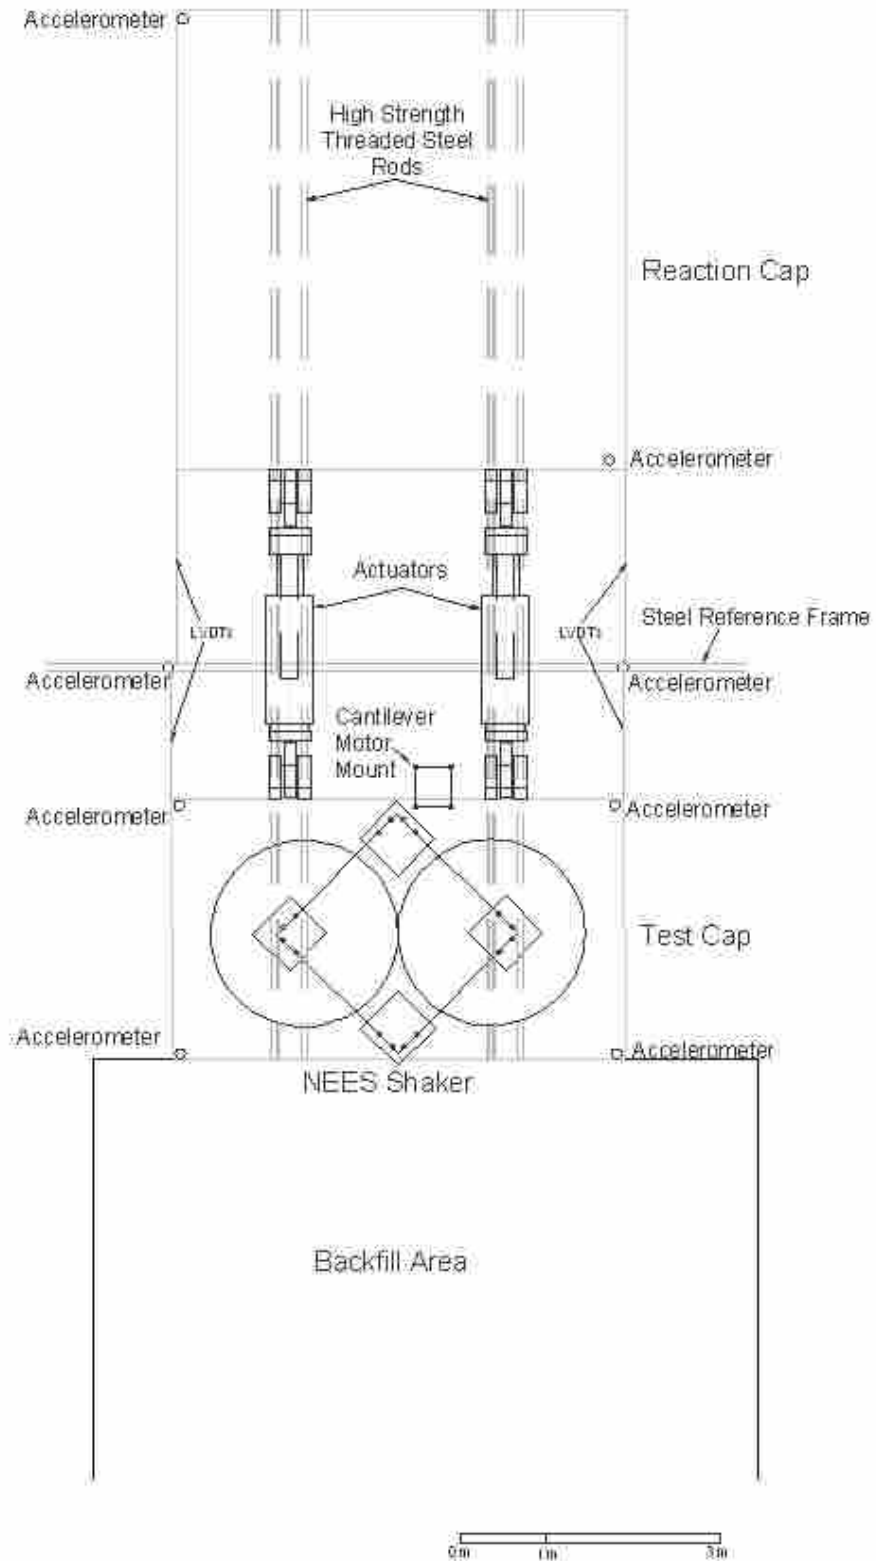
Plan View of Test Cap with Instrumentation and Equipment
